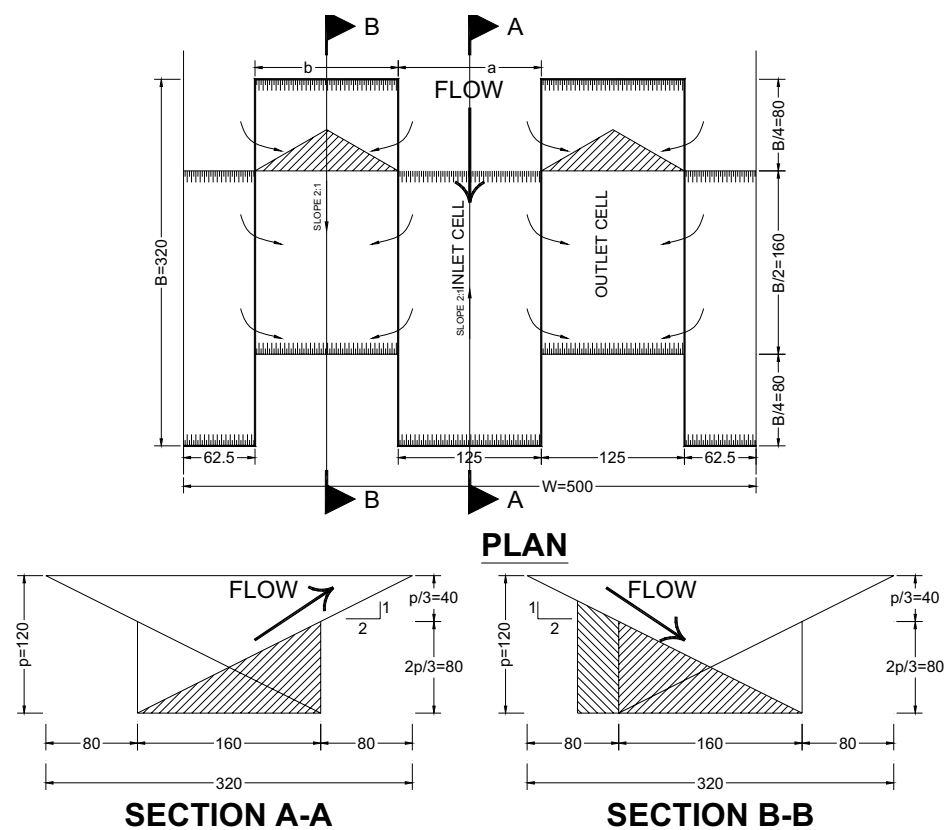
Plan and section of model P_2M_4 with inlet modification (dimensions in mm)
